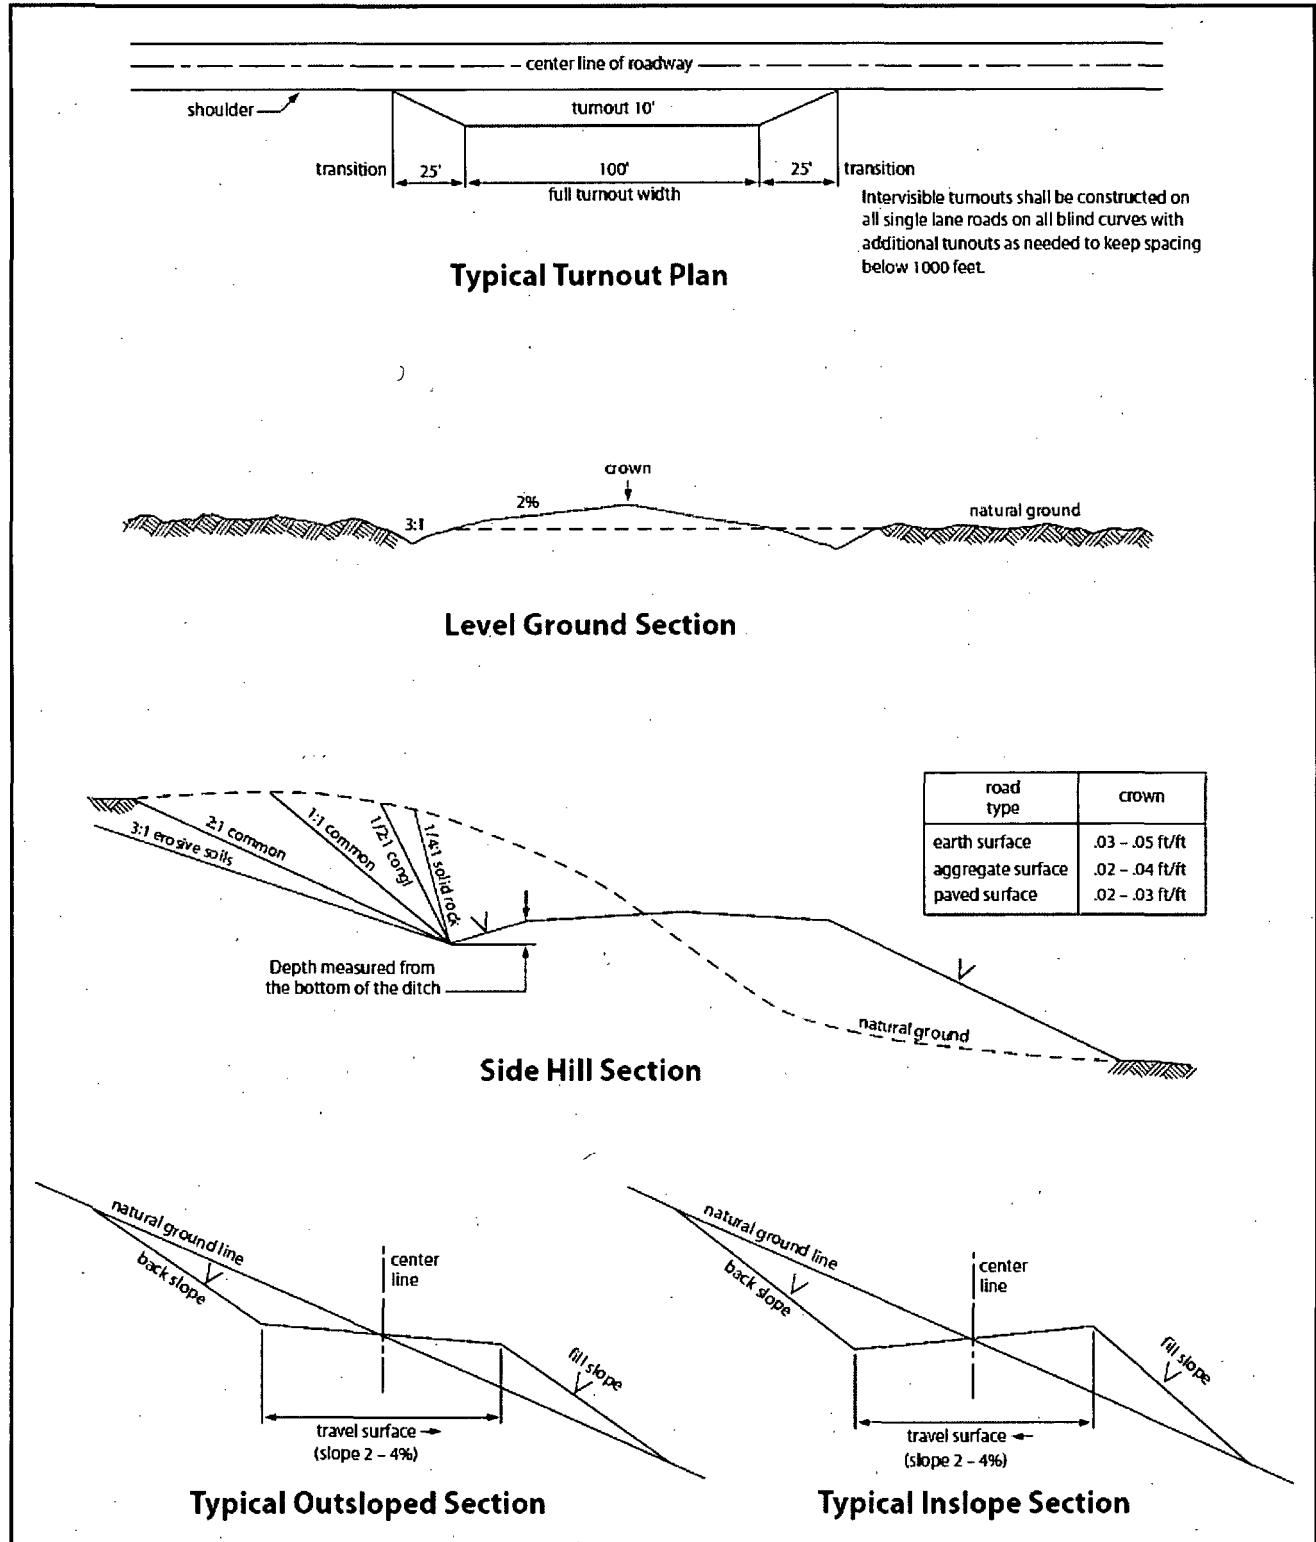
Cross-sections and plans for typical road sections representative of BLM resource or FS local and higher-class roads.
